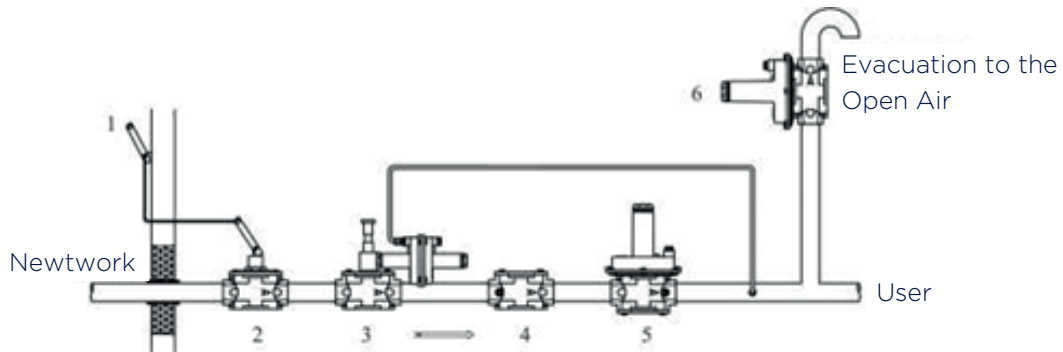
GR 40 Model Gas Regulator with Filter Assembly and Line Diagram
